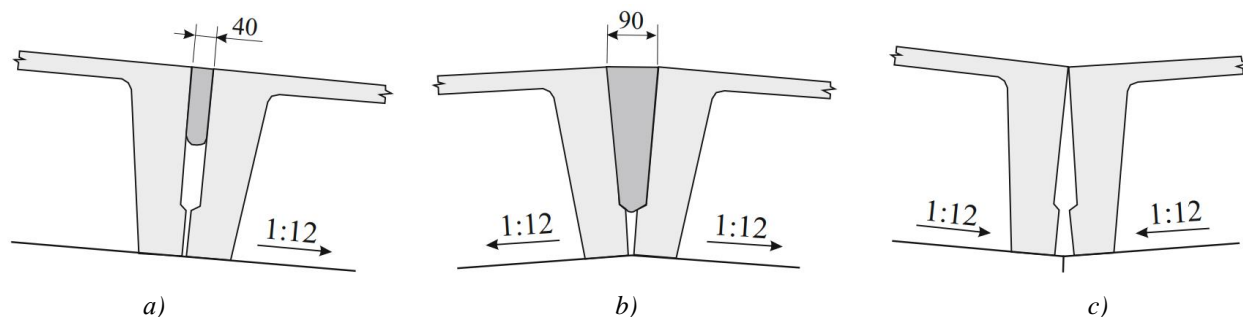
Shape and size of the cross-section of the seams between the ribbed plates: *a* — regular seam; *b* — expanded seam; *c* — closed seam
